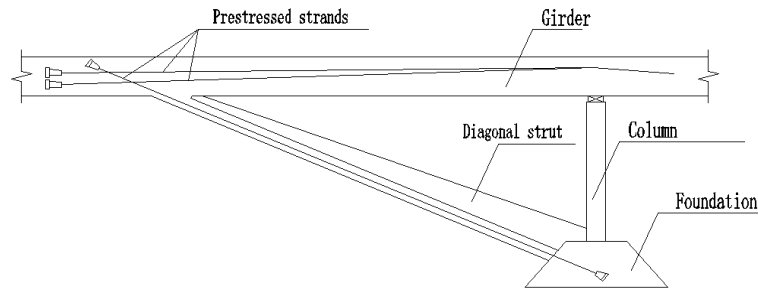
Abutmentless bridge end details [Wolde-Tinsae, 1987]
